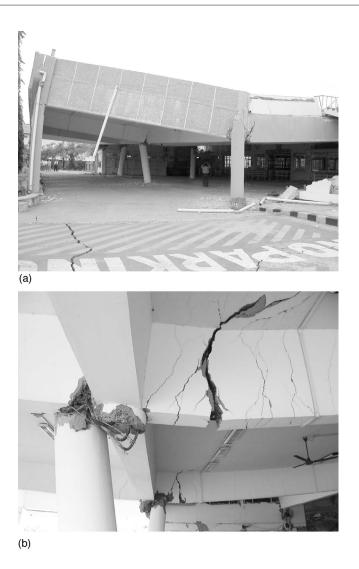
(a) The passenger terminal building at Haddo Wharf collapsed due to the failure of brittle RC columns (photo: S. Jain). (b) Failure of RC columns and large flexural cracks in RC beams (photo: H. Kaushik).
